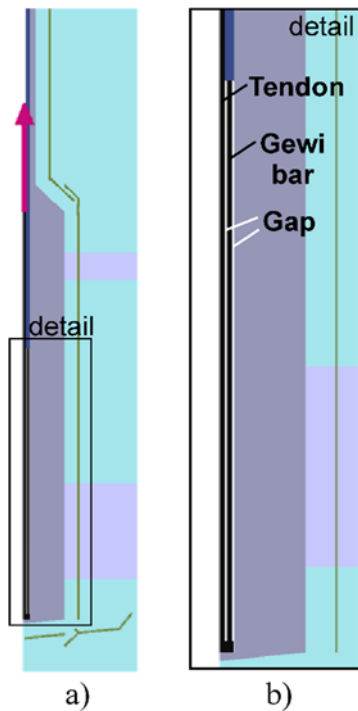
Numerical refinement of anchor 3A – a) fixed length and b) detail of the contact Gewi bar-grout
